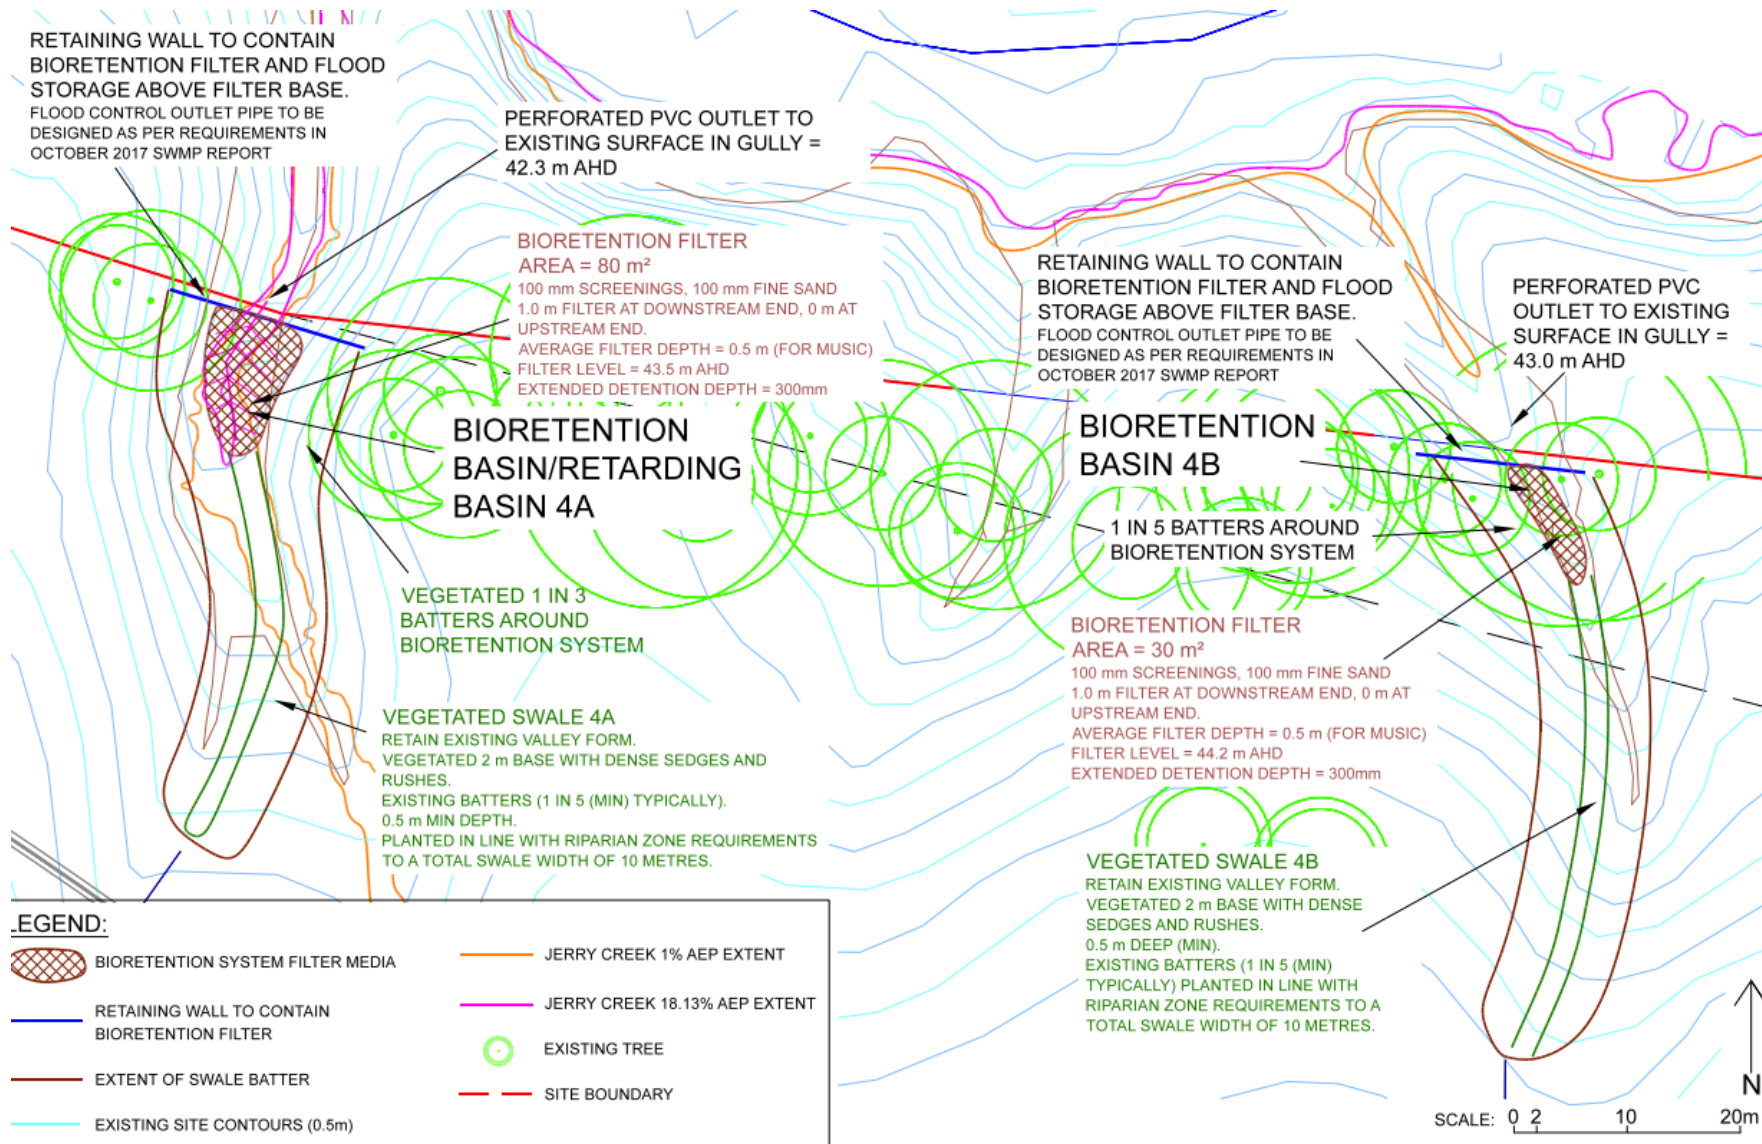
Concept Design, Vegetated Swale 4A, and Bioretention System/Retarding Basin 4A (See SWS Drawing 1774/SWS/7 for full detail)
